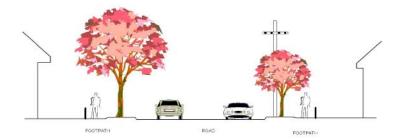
A tall species and a smaller species can be planted in the same street, if site conditions permit
